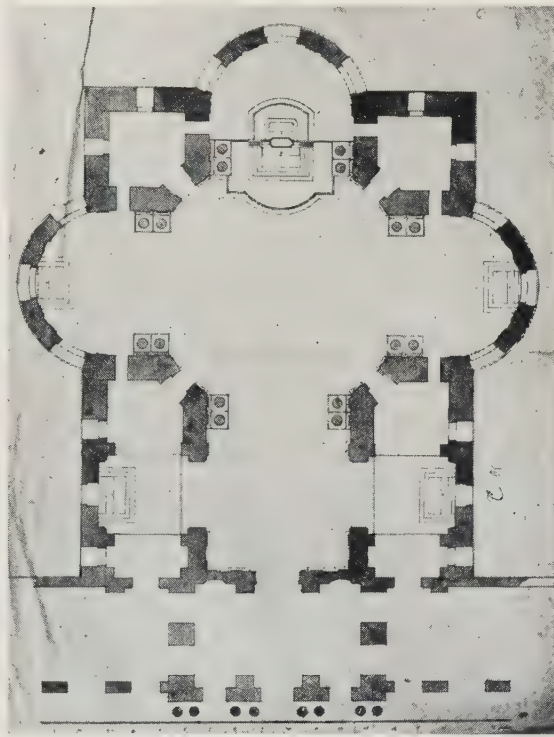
Second plan for a domed chapel at the center of the Aile Nord, about 1683.
